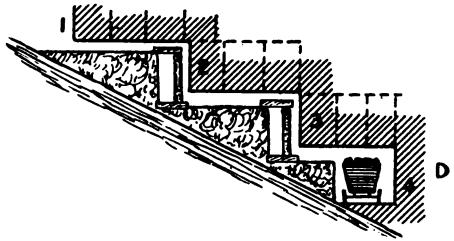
Section showing Stepped Appearance of Workings and Stowing in Removal of Couchons.
